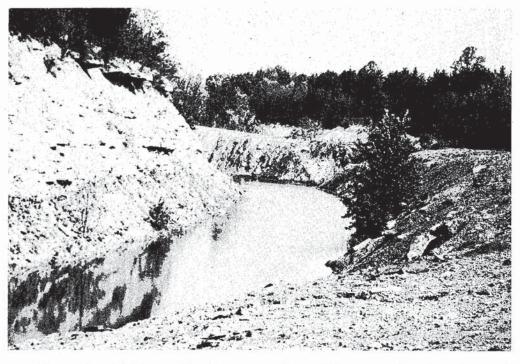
Conditions before reclamation work showing highwall, strip pit, and spoil bank
